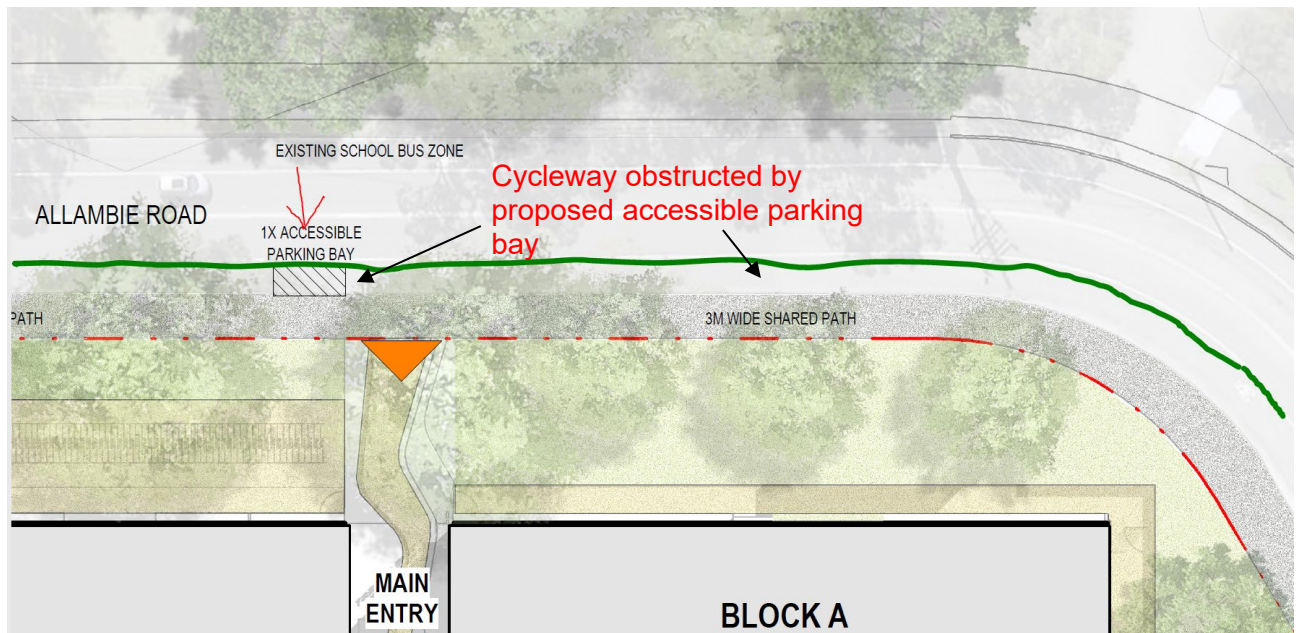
Proposed accessible parking bay is obstructing the existing dedicated cycle lane.
